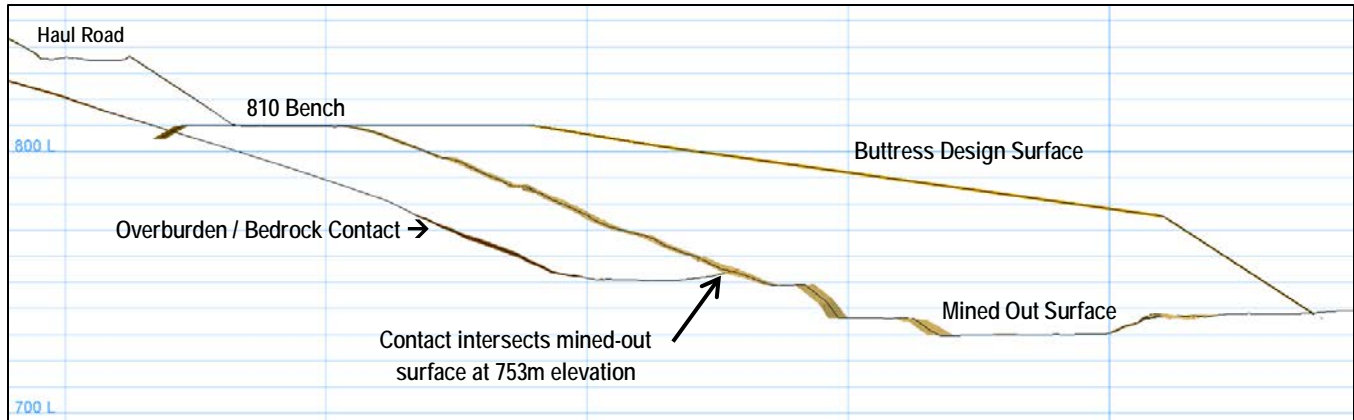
Detailed section view through centerline of buttress at 0.00° Azimuth, looking west.
